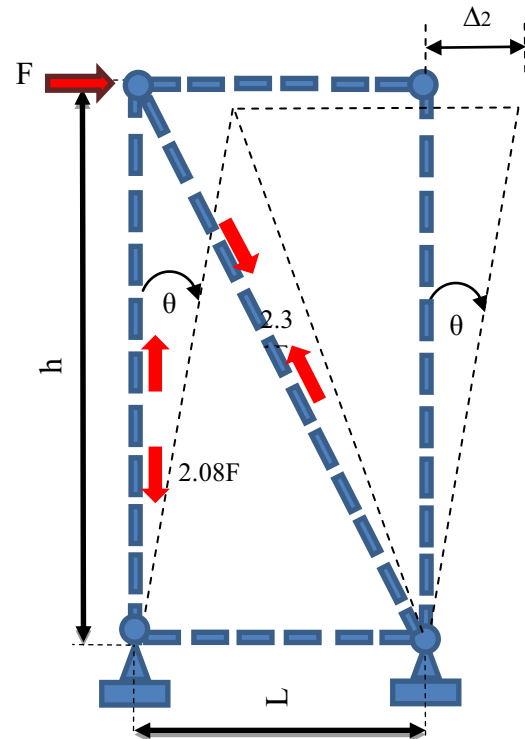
Loaded and unloaded state of diagonal bracing wall unit.
